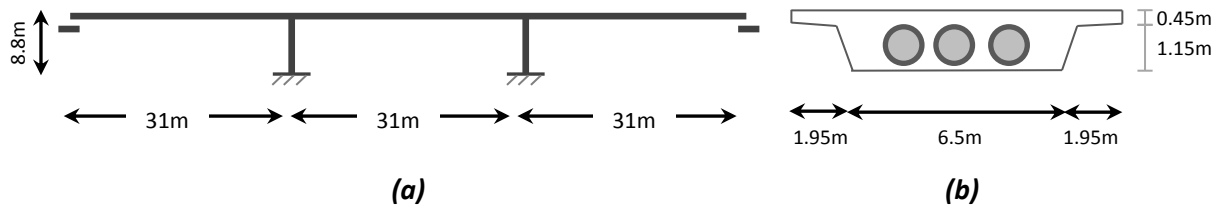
(a) geometry of the bridge and (b) section of the deck
